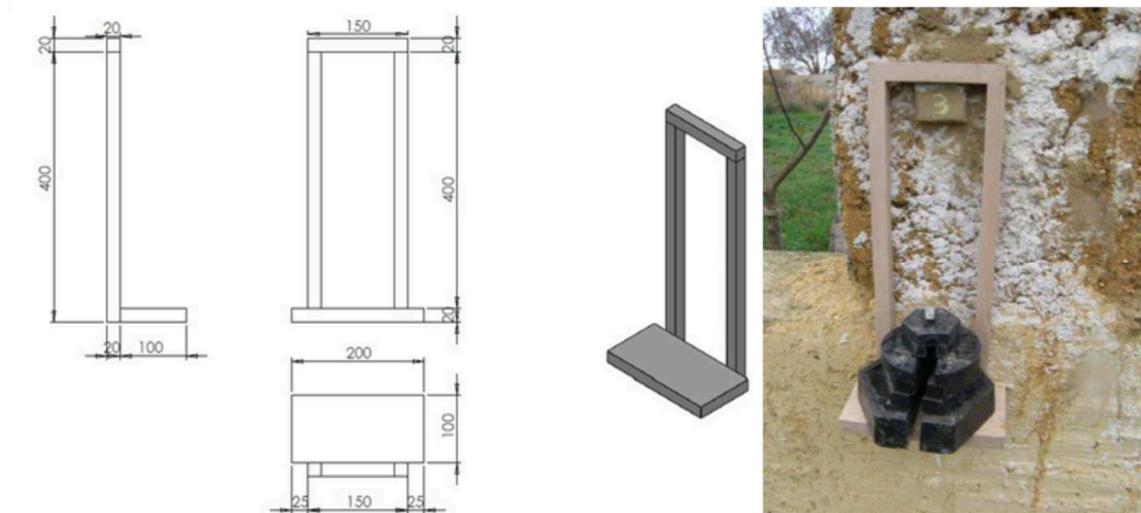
Shear test loading device example, 400 mm high, 150 mm large and 20 mm thick.
